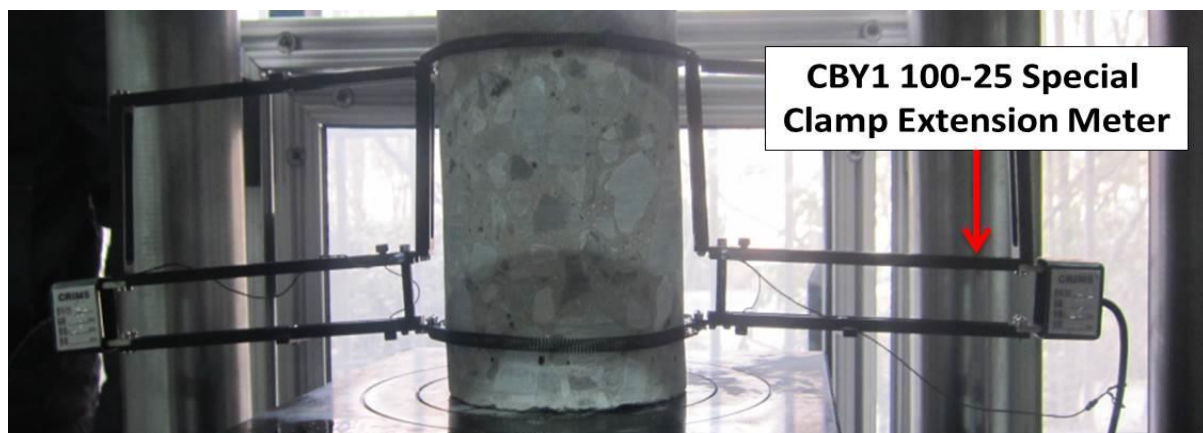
CBY1 100-25 Special Clamp Extension Meter
